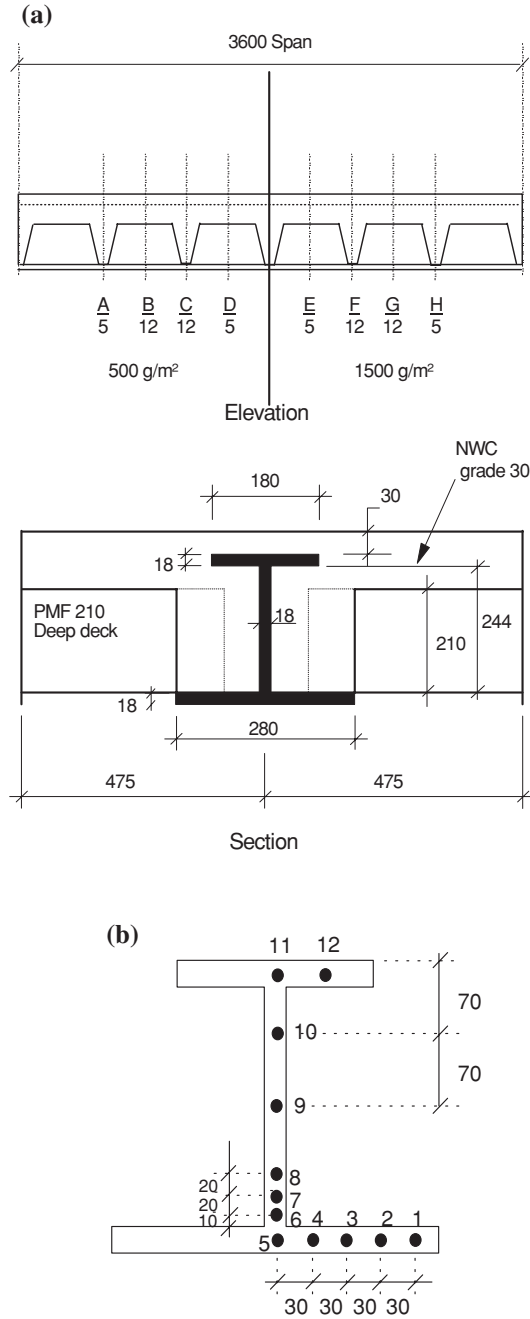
The ASB test beam. a Elevation and section views; b position of thermocouples
